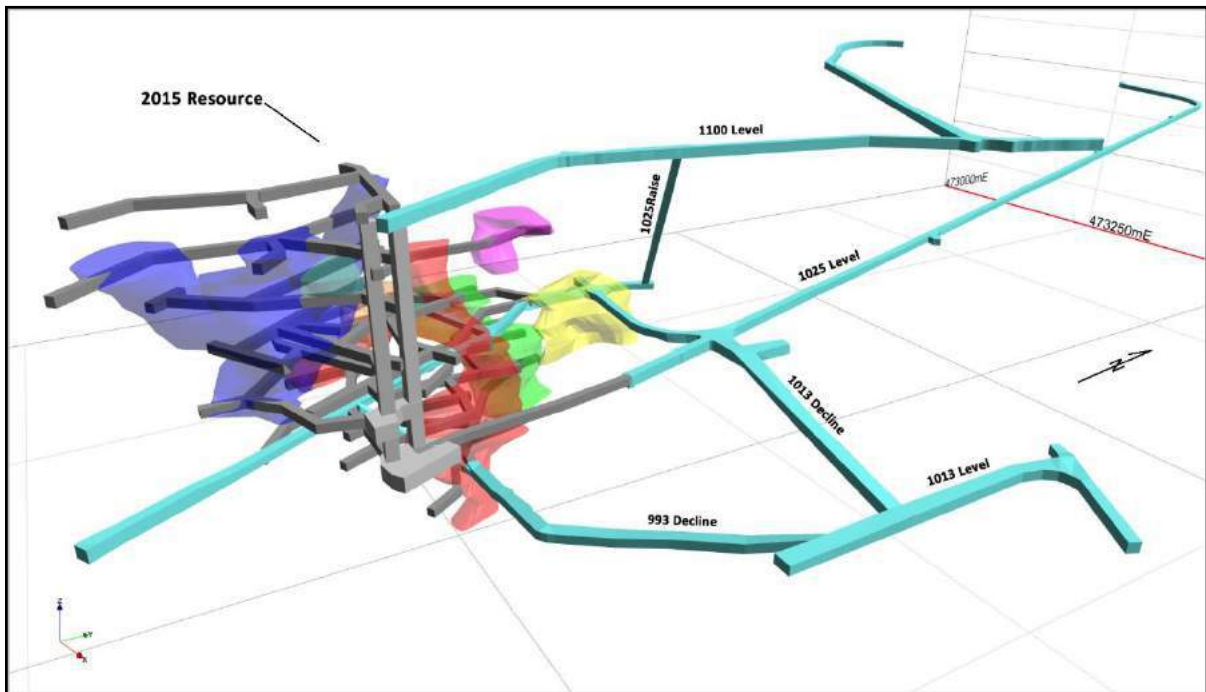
Proposed Development – All Stopes with proposed underground development (Looking NW)
